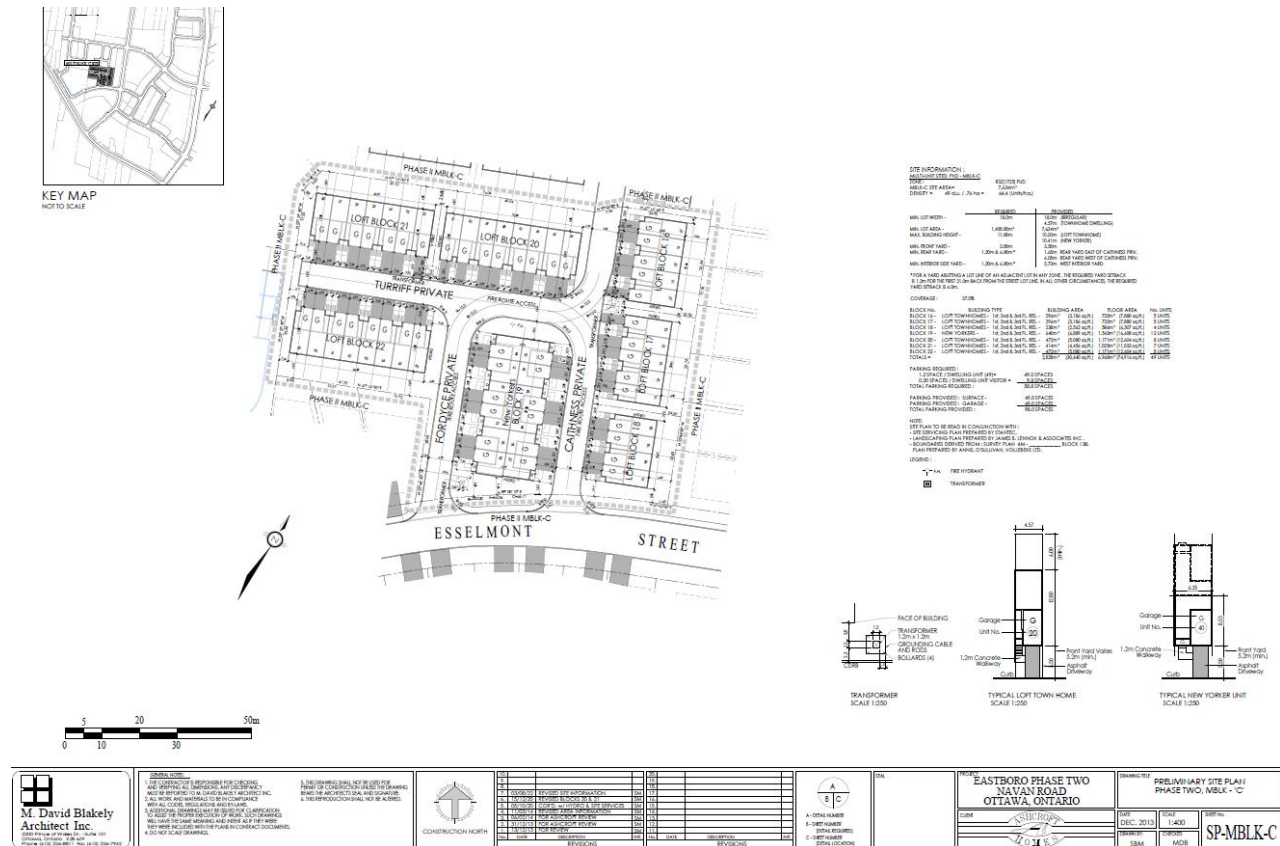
Site Plan (M. David Blakely Architect Inc.)
